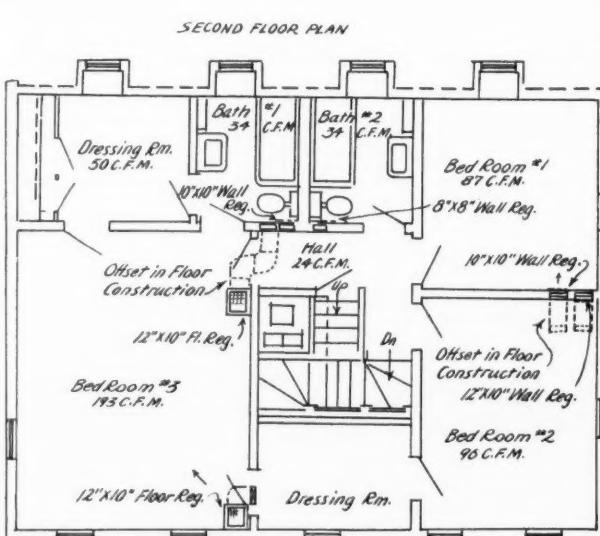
The second floor plan shows one or two registers in each room, no returns and a number of cross-overs.
